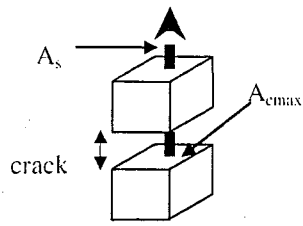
Yielding of reinforcing bar at crack plane
